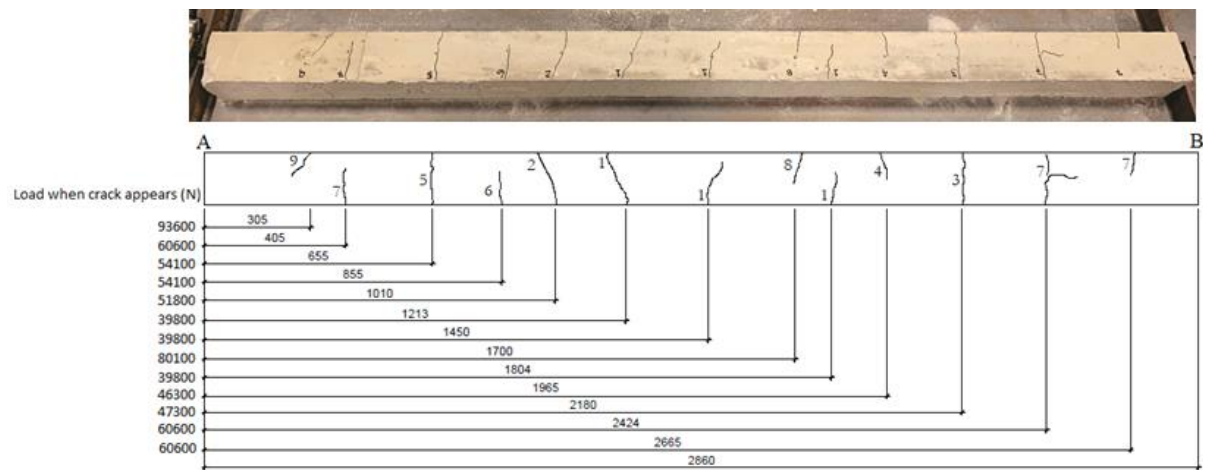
Prism test and crack pattern: #6 steel – specimen 2.
